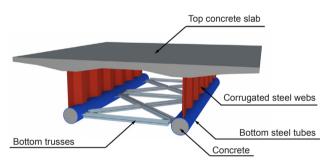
Typical cross-section of composite box girders with CSWs and trusses.
